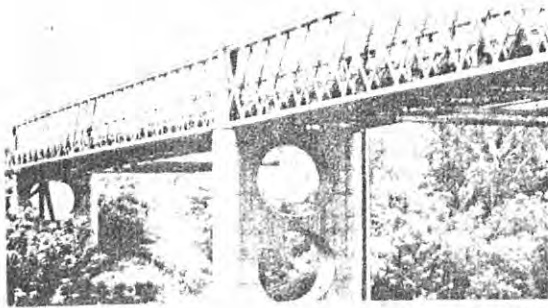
Typical examples of British bridge technology, lattice girders (for road and rail), and the plate web girder. Braced cylindrical piers were preferred and the plated diaphragms minimised the trapping of flood debris.
